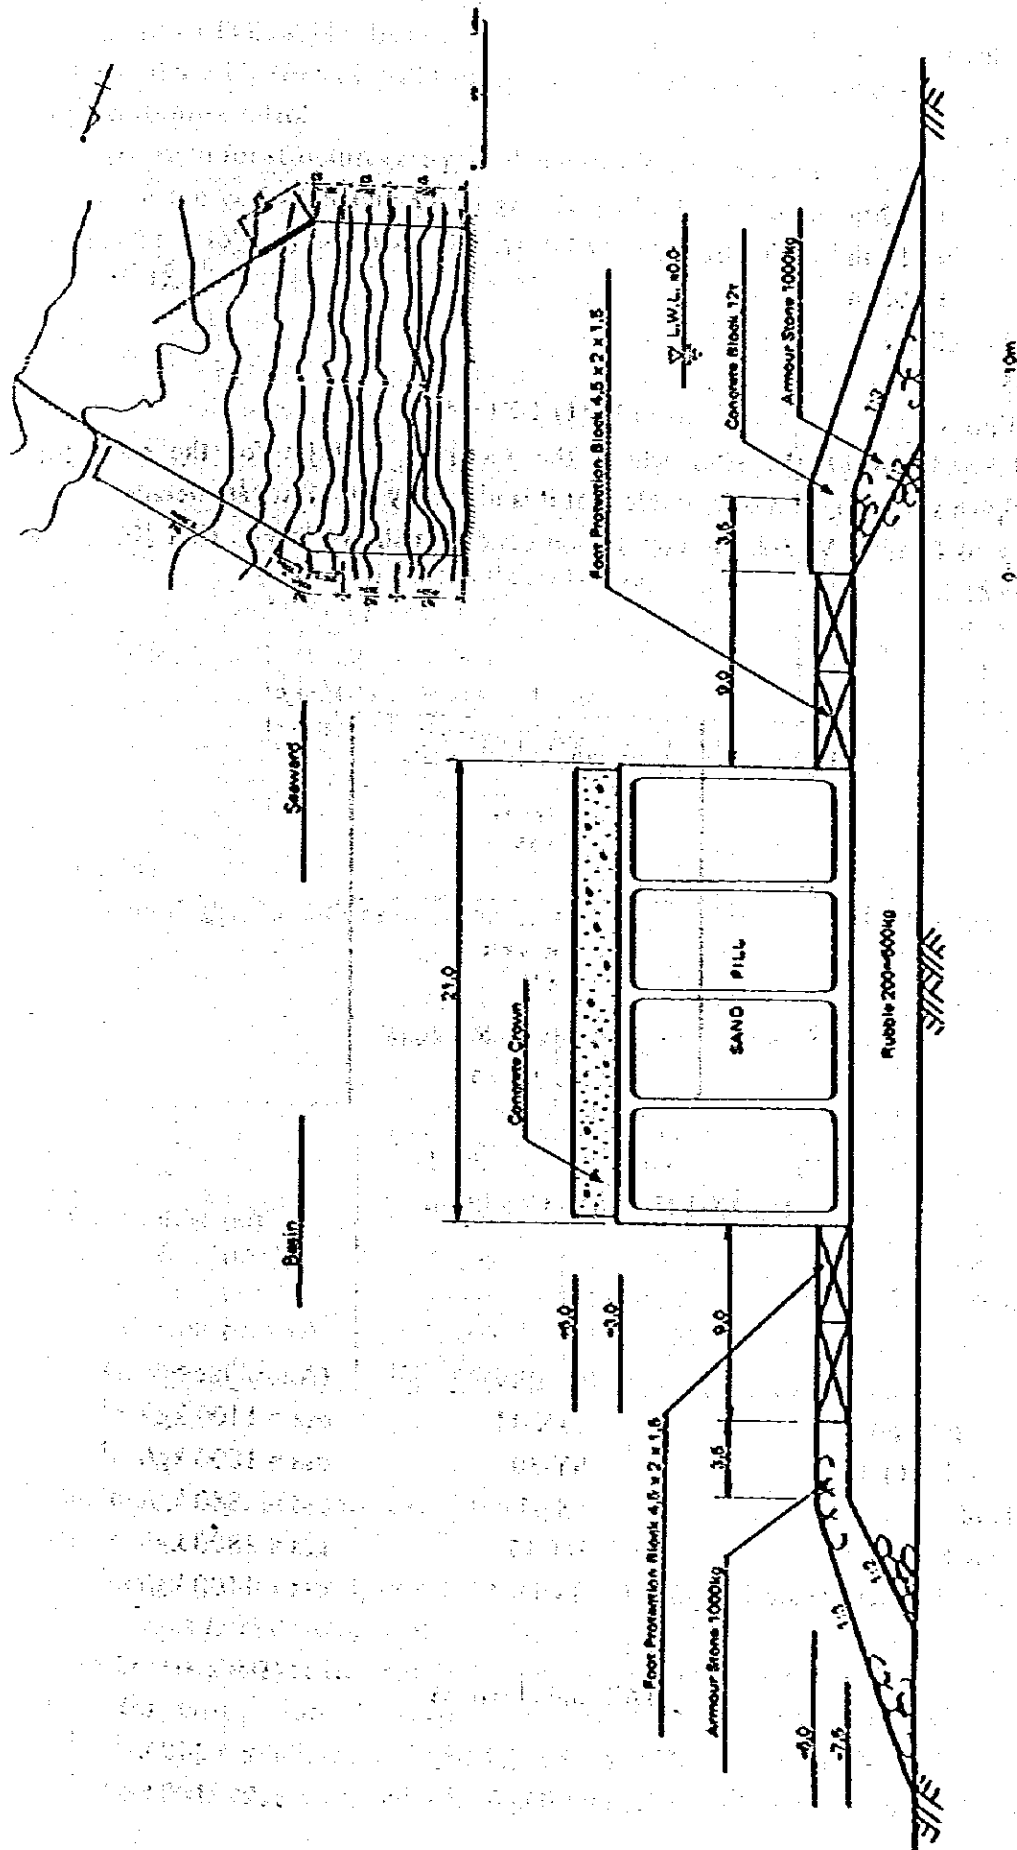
(9) Standard Crosssection of Breakwater (S4 Section)
